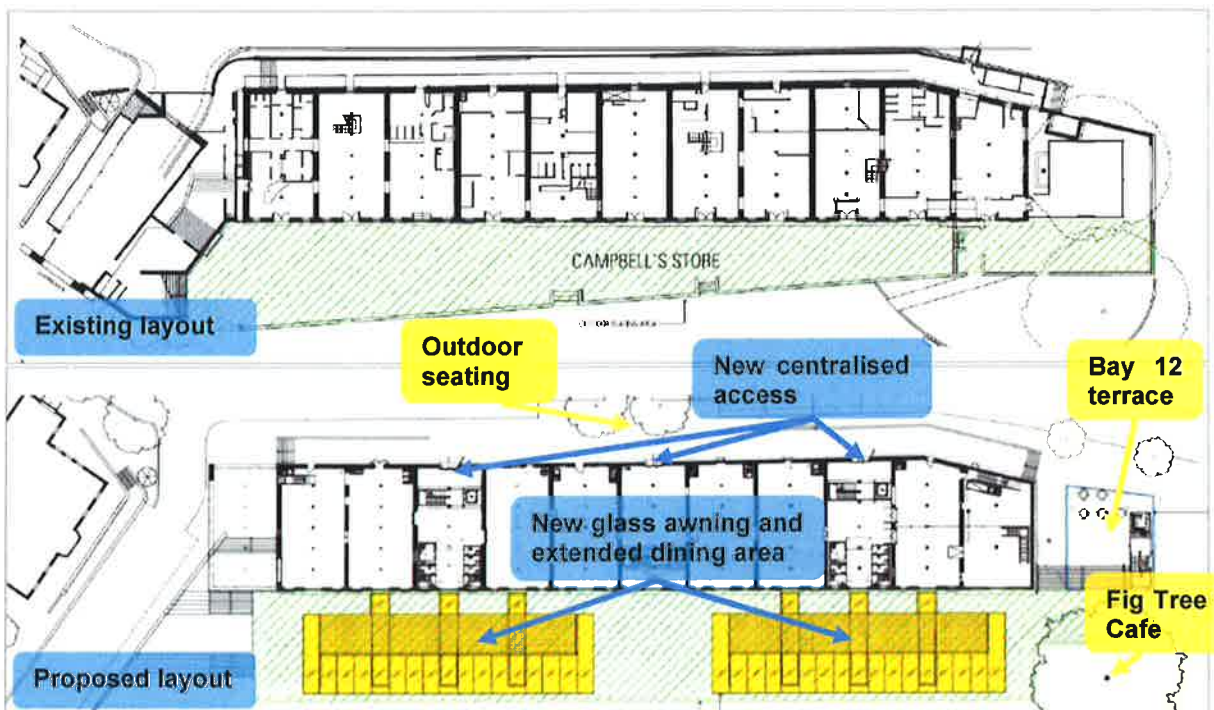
The existing and proposed layout of the site with the amended eastern outdoor dining area shown in green (Source: Applicant's EIS).
